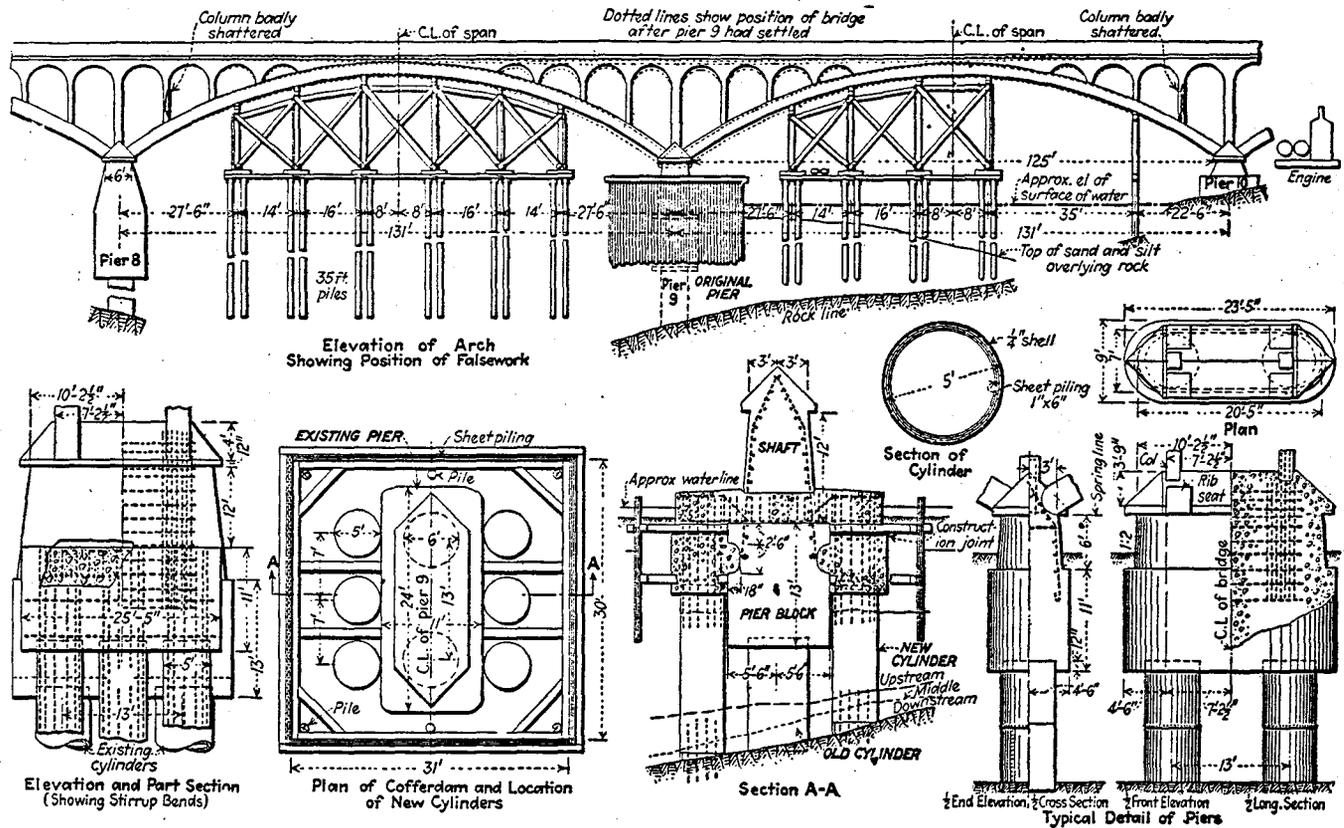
PIER 9 UNDERPINNED BY NEW CYLINDERS SUNK ALONGSIDE, WITH REINFORCED-CONCRETE BEAM CAP
